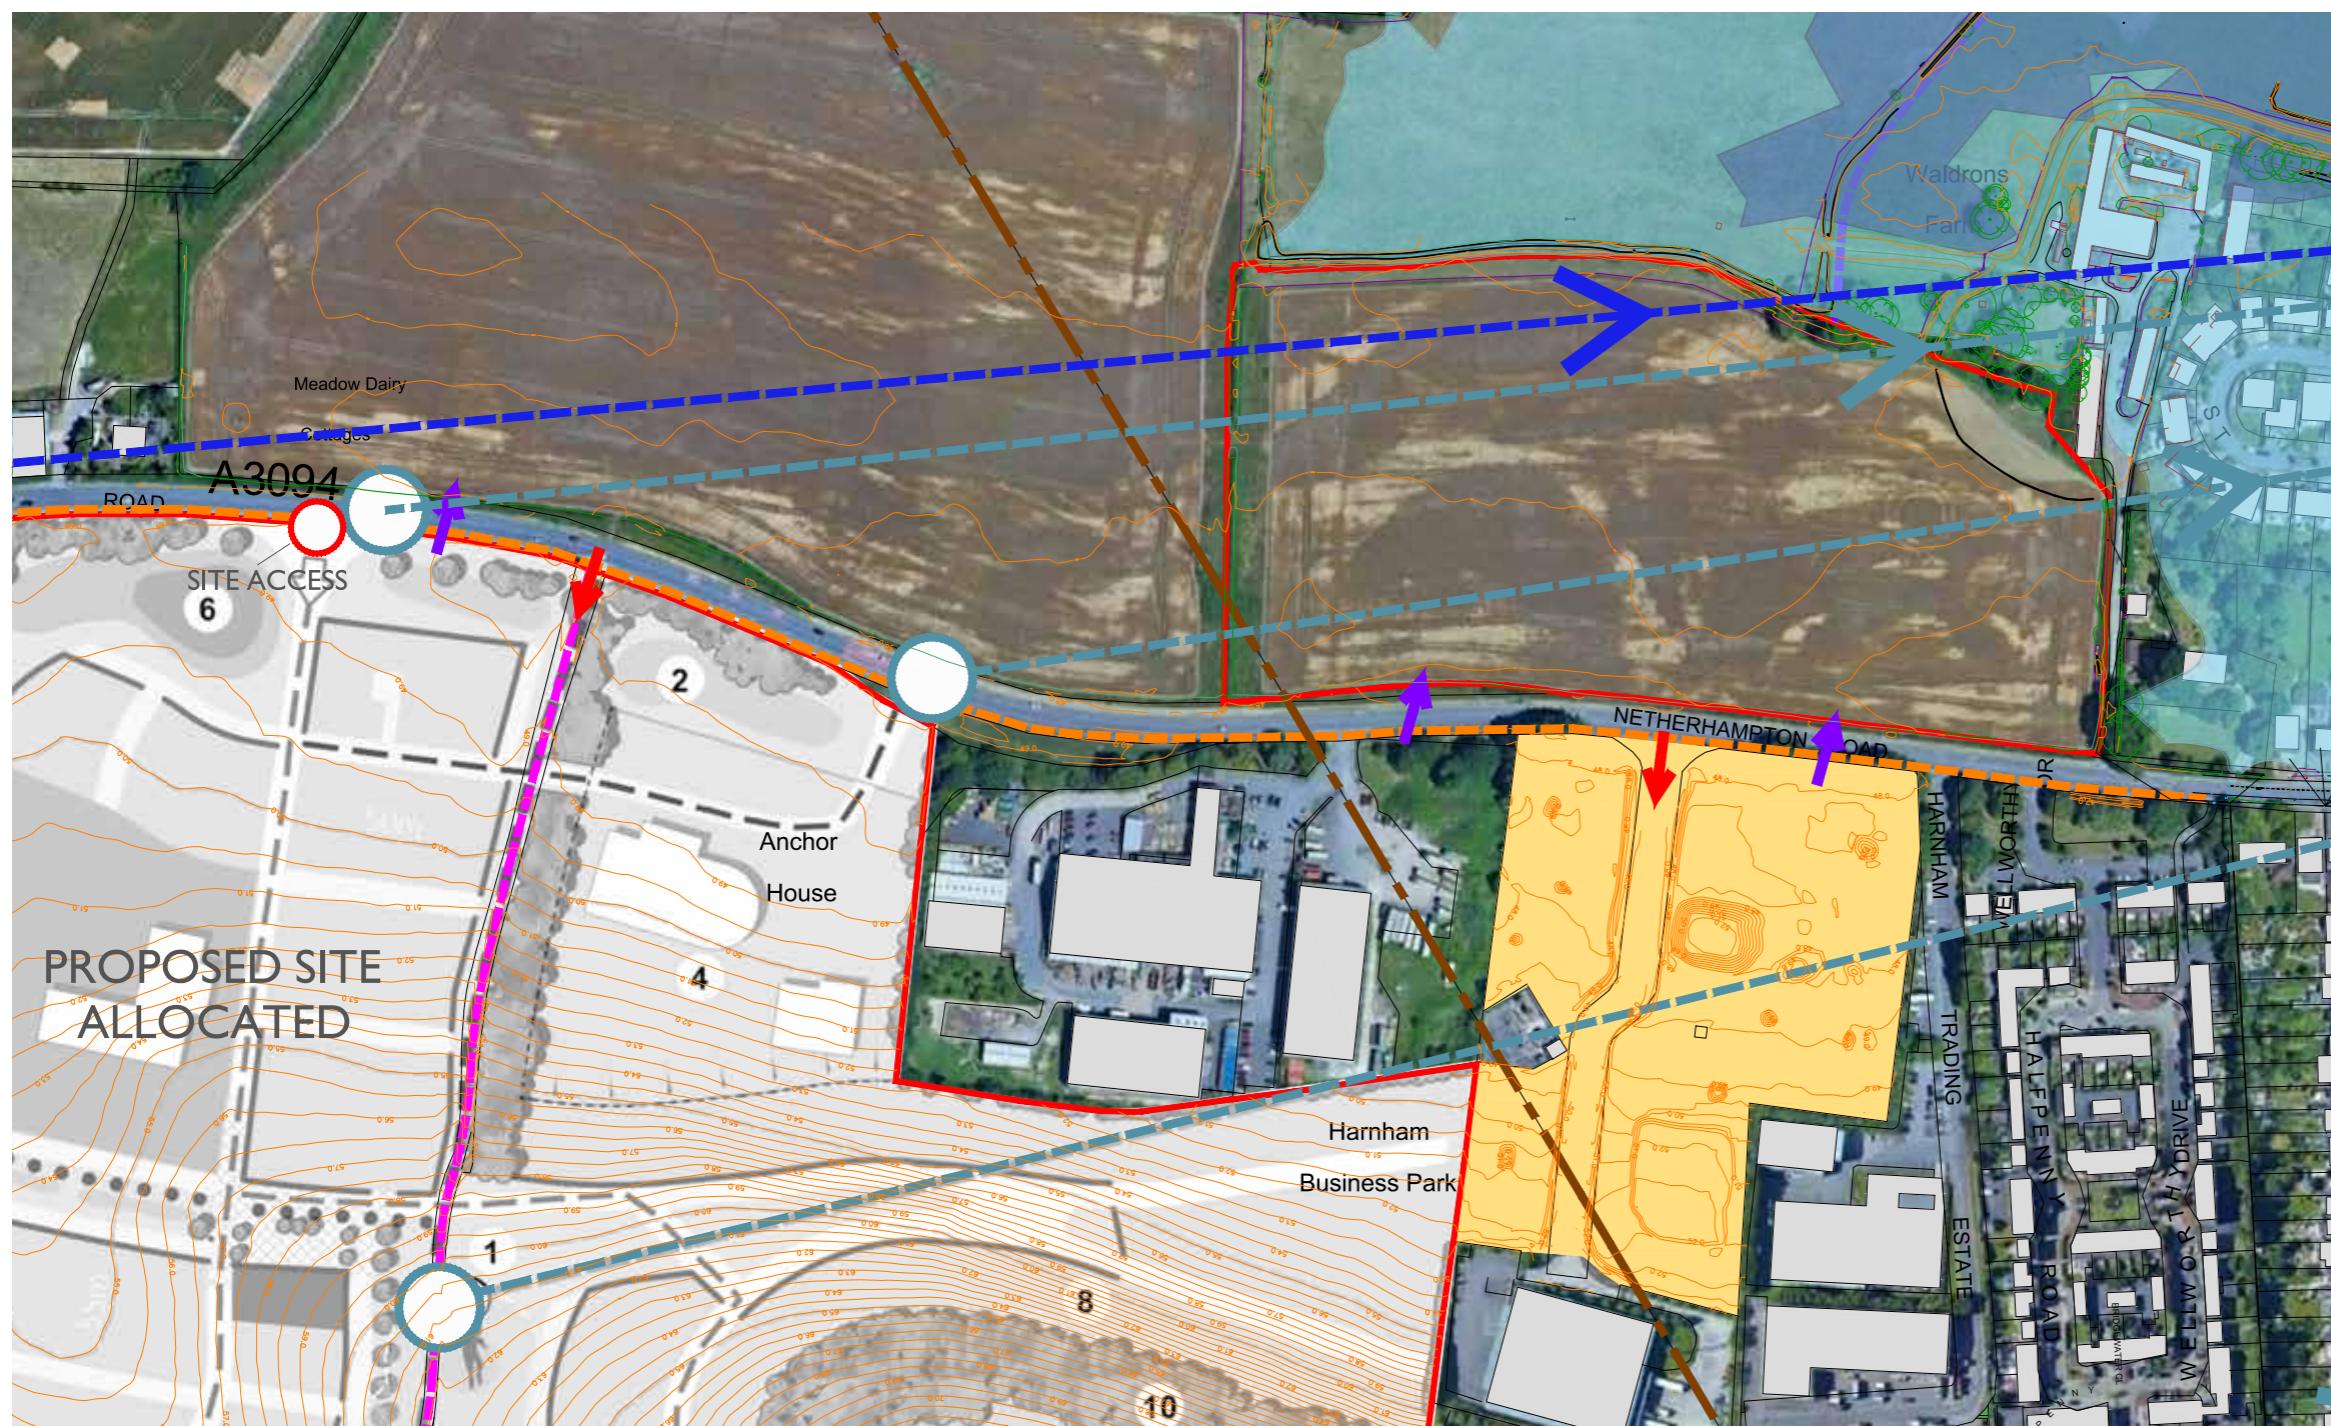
EXISTING CONSTRAINTS PLAN
